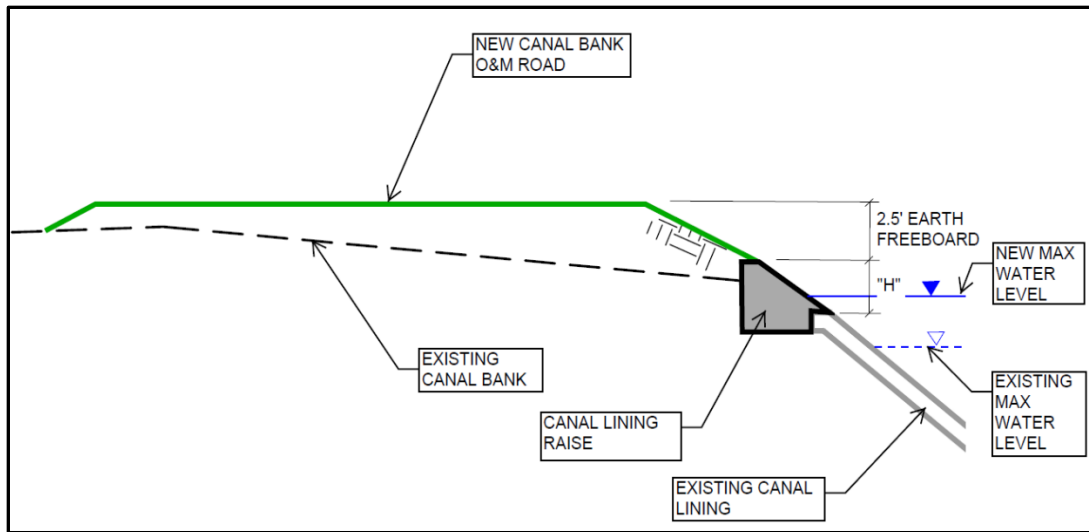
Canal Lining Raise in Segment 1 and Segment 4b of the Recommended Plan
